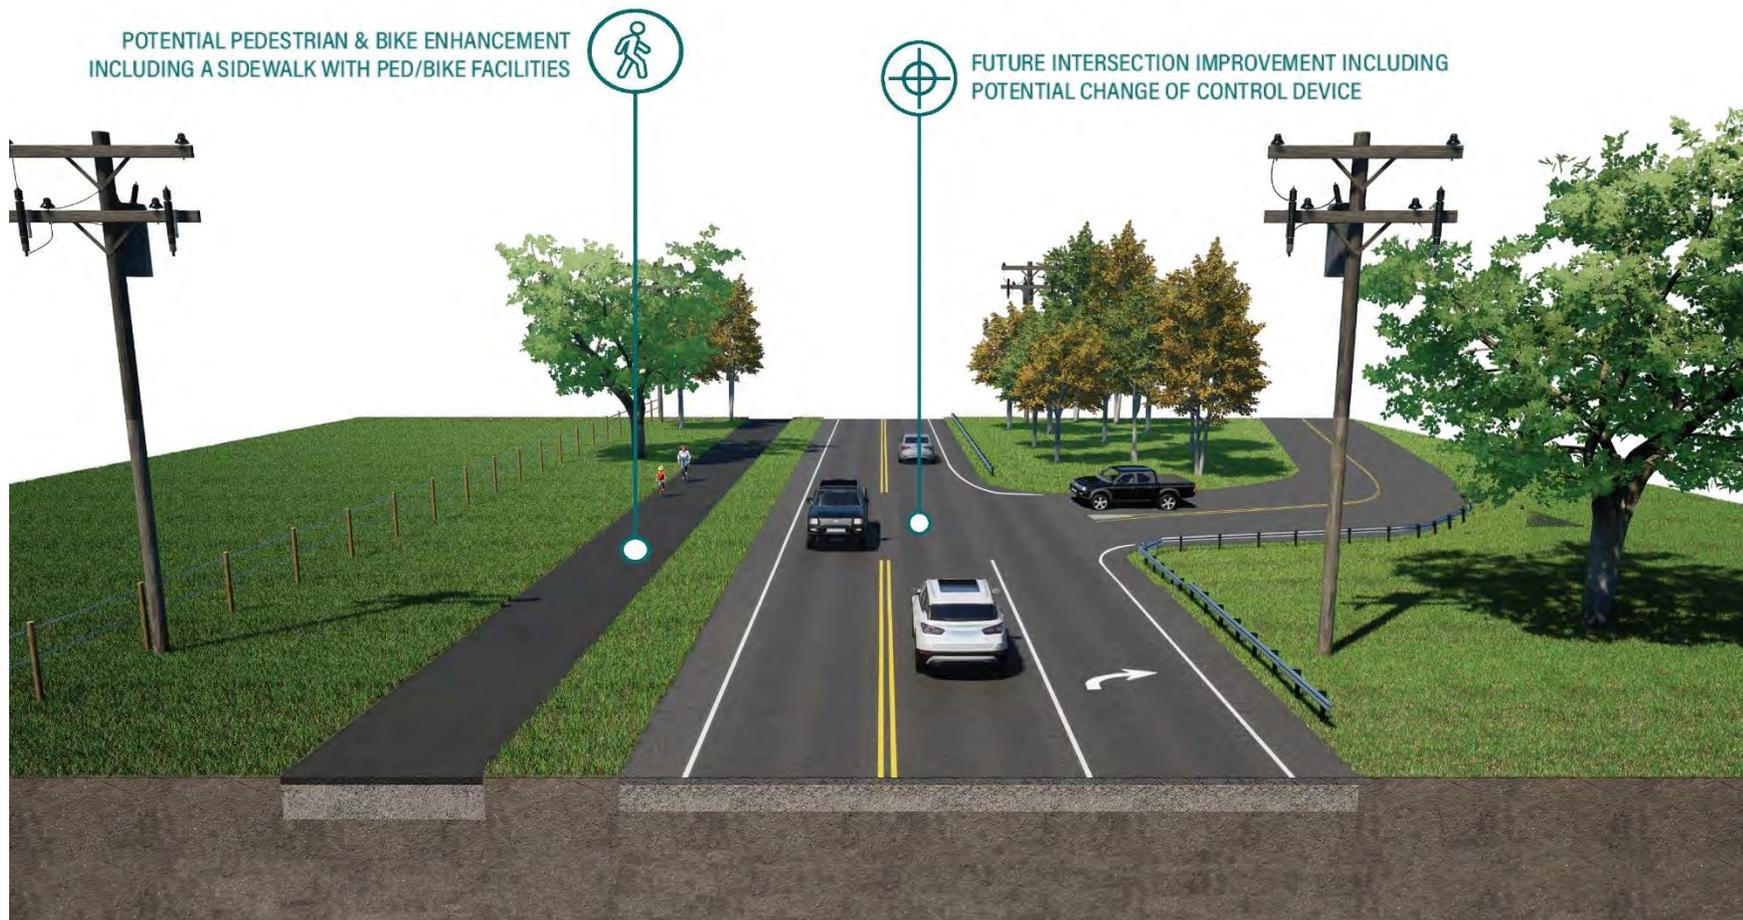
Typical Section at Dinkel Ave and Volunteer Drive
